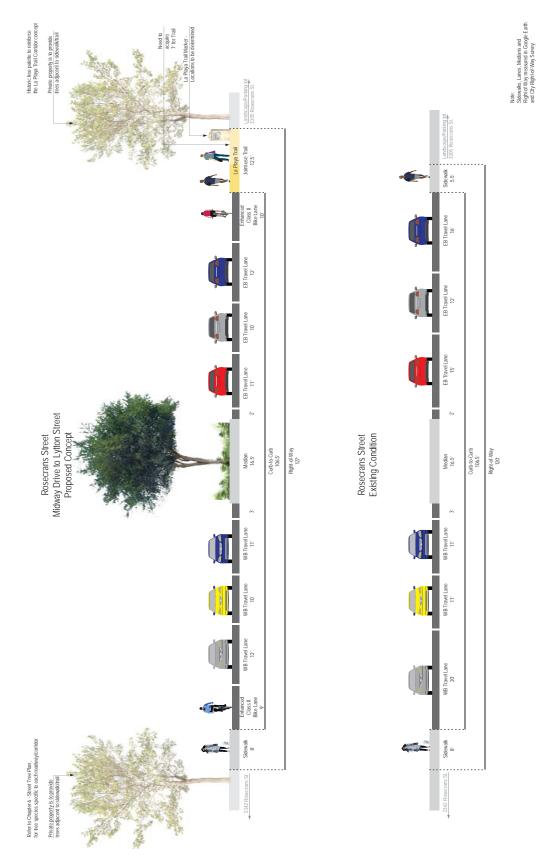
Street Concept Plan Exhibit - Rosecrans St., Midway Dr. to Lytton St.
